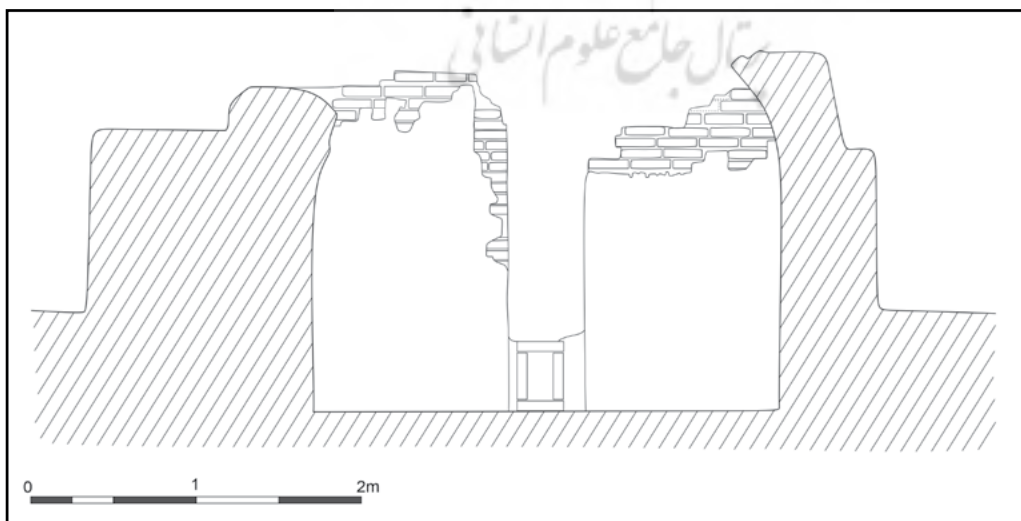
An air flue placed on the floor of lime and brick-manufacturing kiln no. 1 (Author, 2002).
